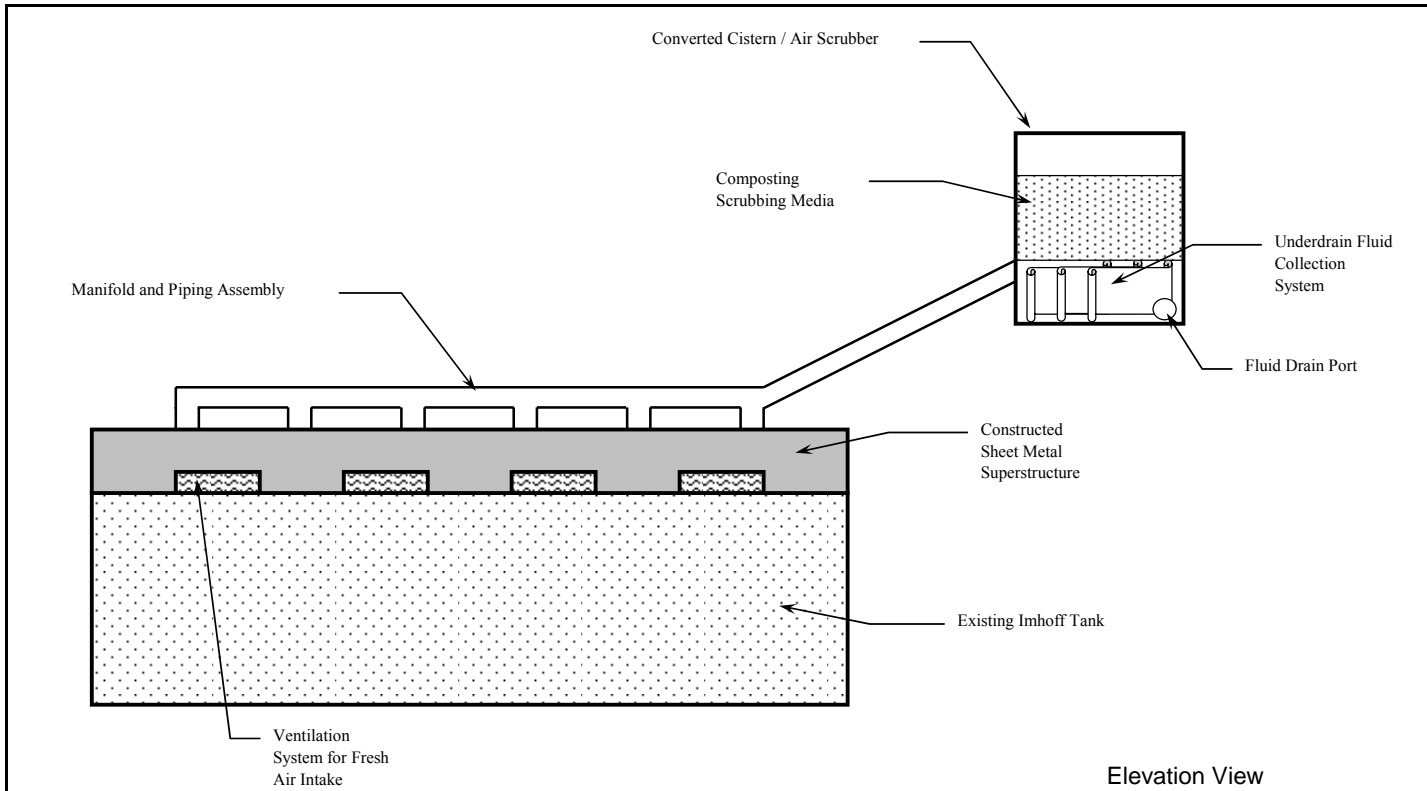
Conceptual Elevation View of Odorous Gas Collection System and Air Scrubber
